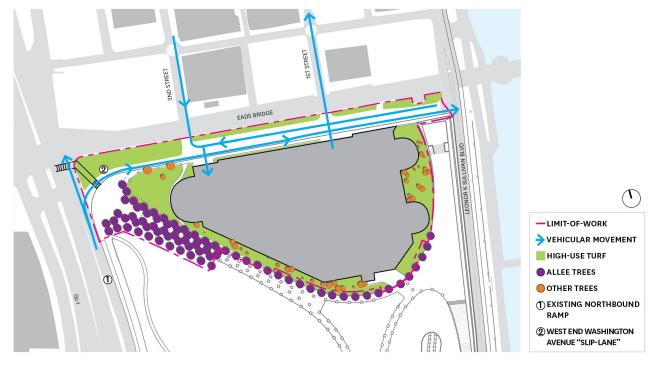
Alternative 2 North Gateway (Source: MVVA)
